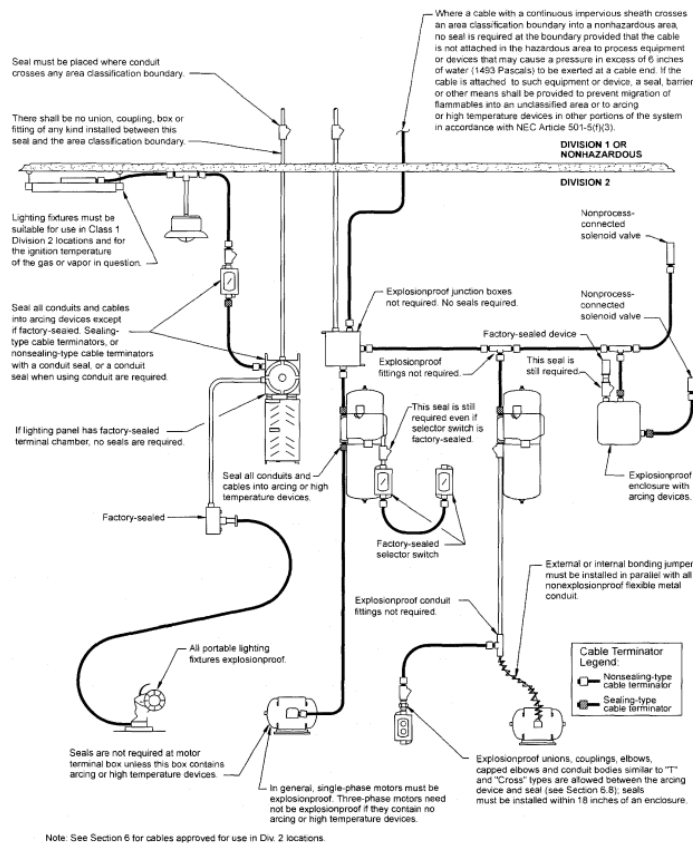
Typical Class 1, Division 2 Electrical Installation Conduit or Cable System
